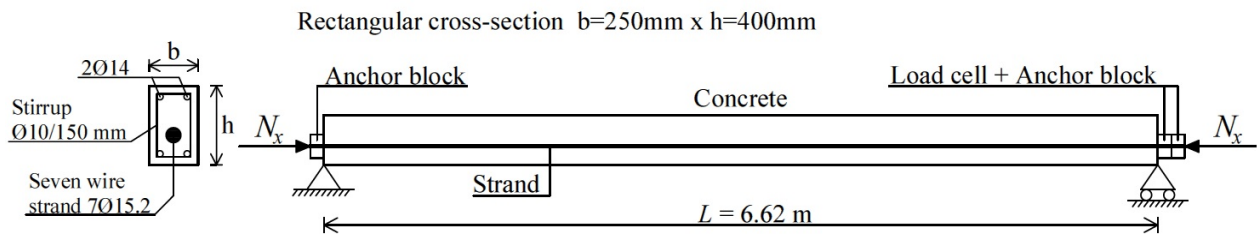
Scheme of the post-tensioned concrete beam specimen.
